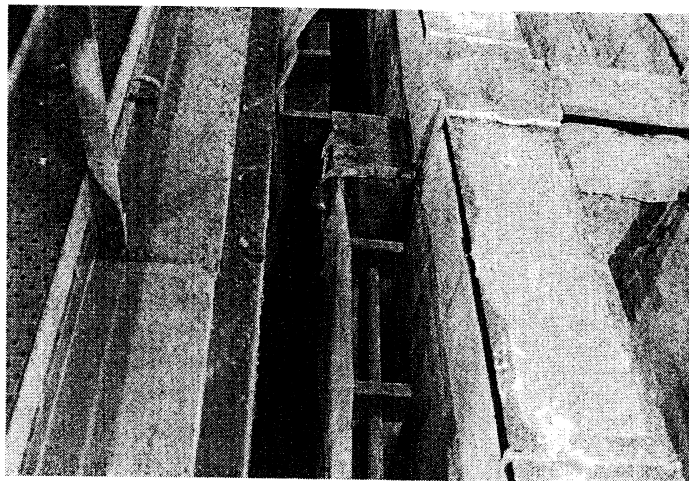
Wall insulation application of refractory mixes containing reused insulating castable.
